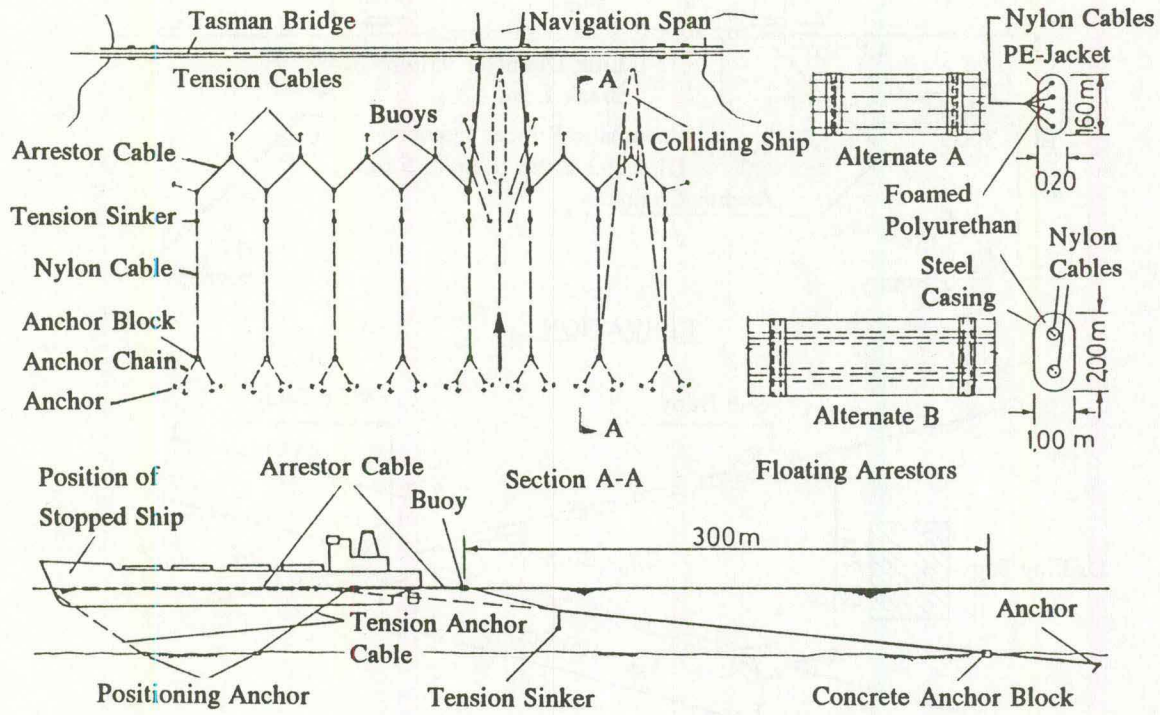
Cable System Evaluated for use on the Tasman Bridge, Australia [31]. (All Units are Metric)
